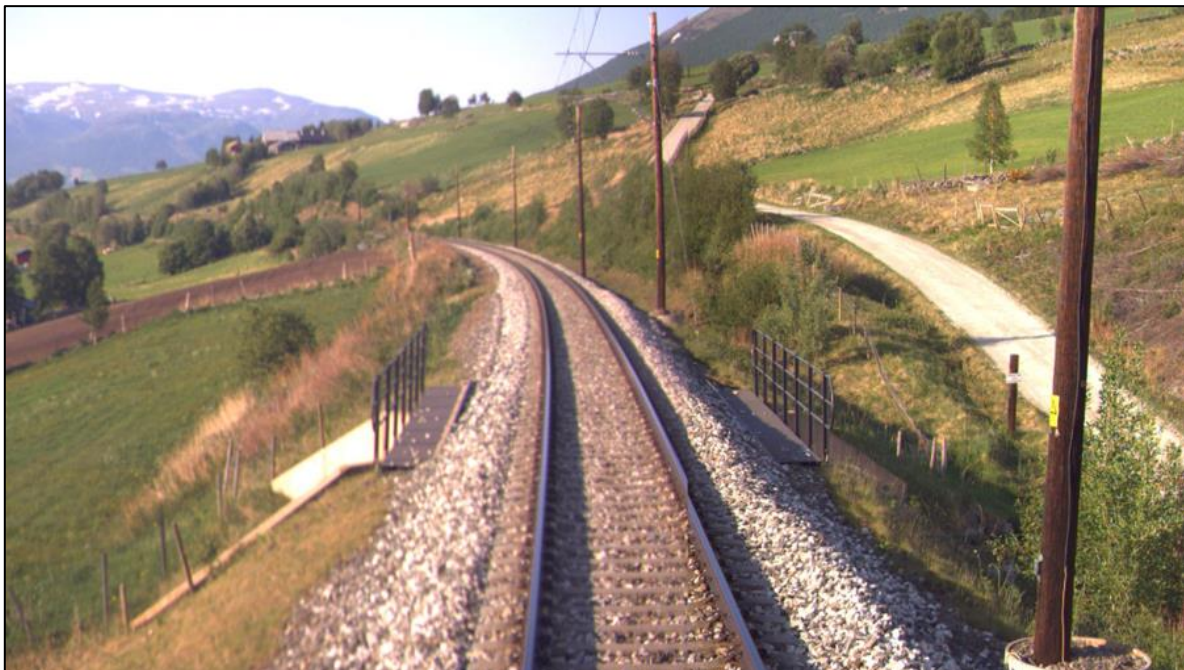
ROGER 1000 photo taken coach a couple of meters before passing the culvert (Source: Bane NOR)
